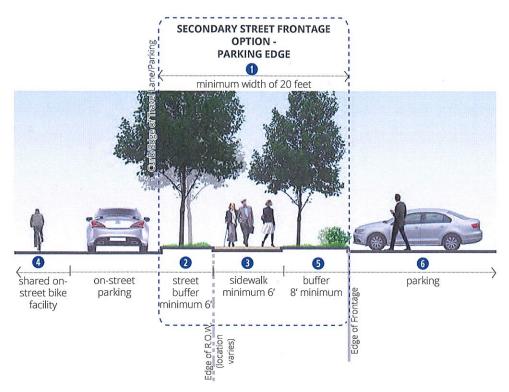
Secondary Street Frontage Option - Parking Edge
